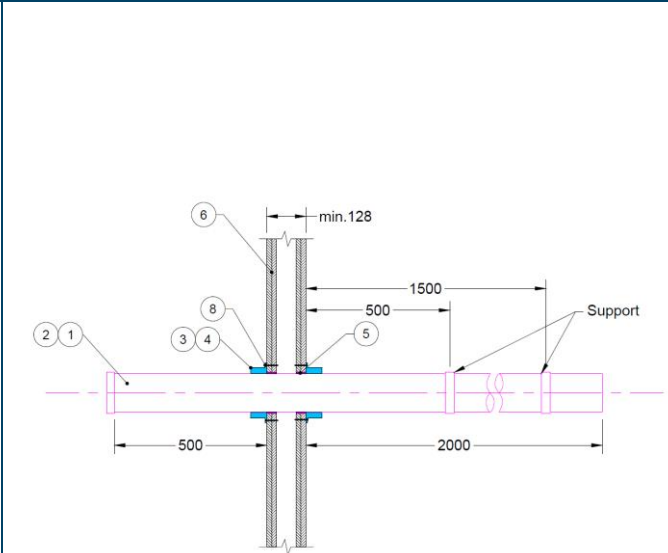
Plastic pipes with PROMASEAL® FC 40-150 collars (wall side view)
